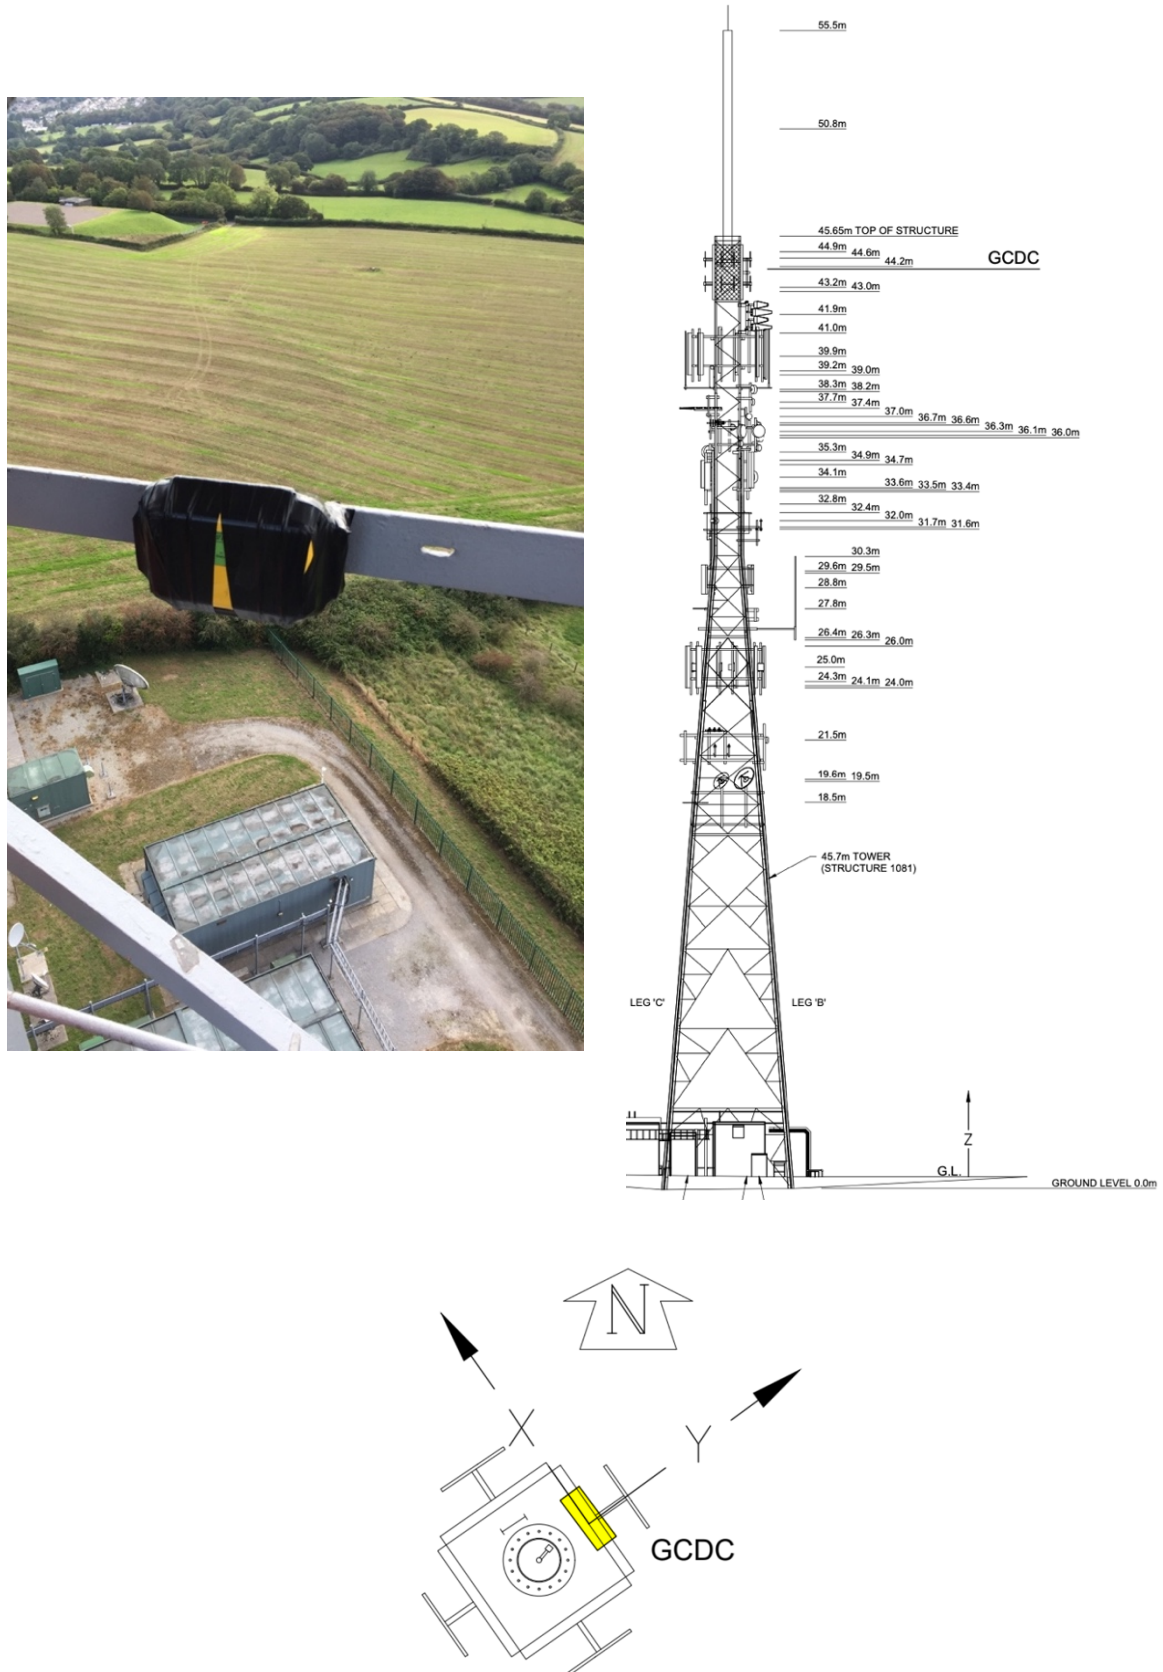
Accelerometer GCDC placement. Picture, elevation and plan view.
